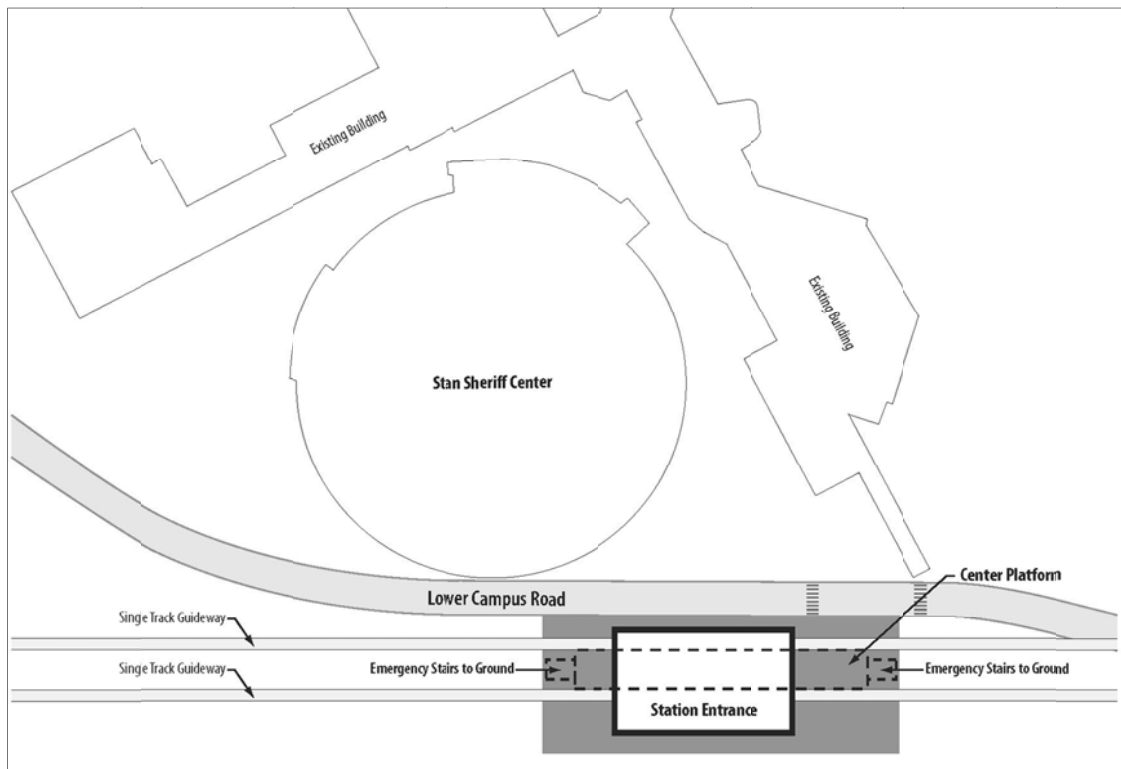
Beretania Street Tunnel Alternative UH Mānoa Station
